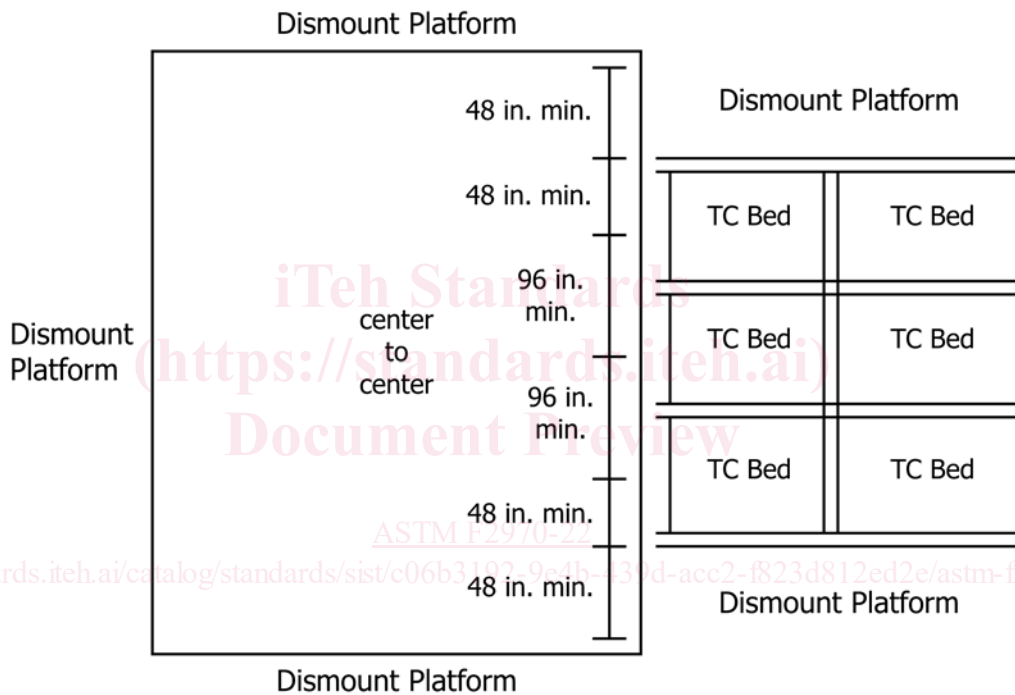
Example TC Foam Pit Overview With Dismount Platforms
